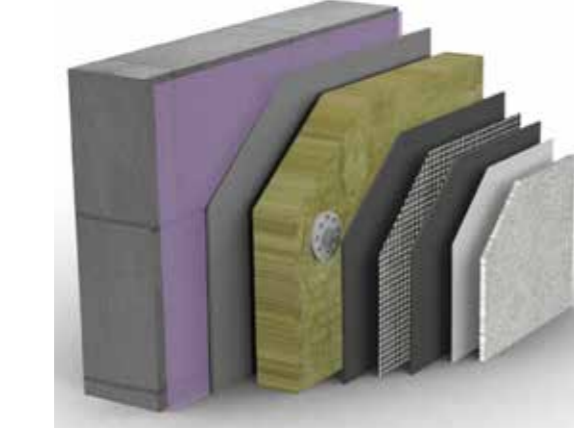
3D section view of EWI insulation over existing building, including roof insulation
